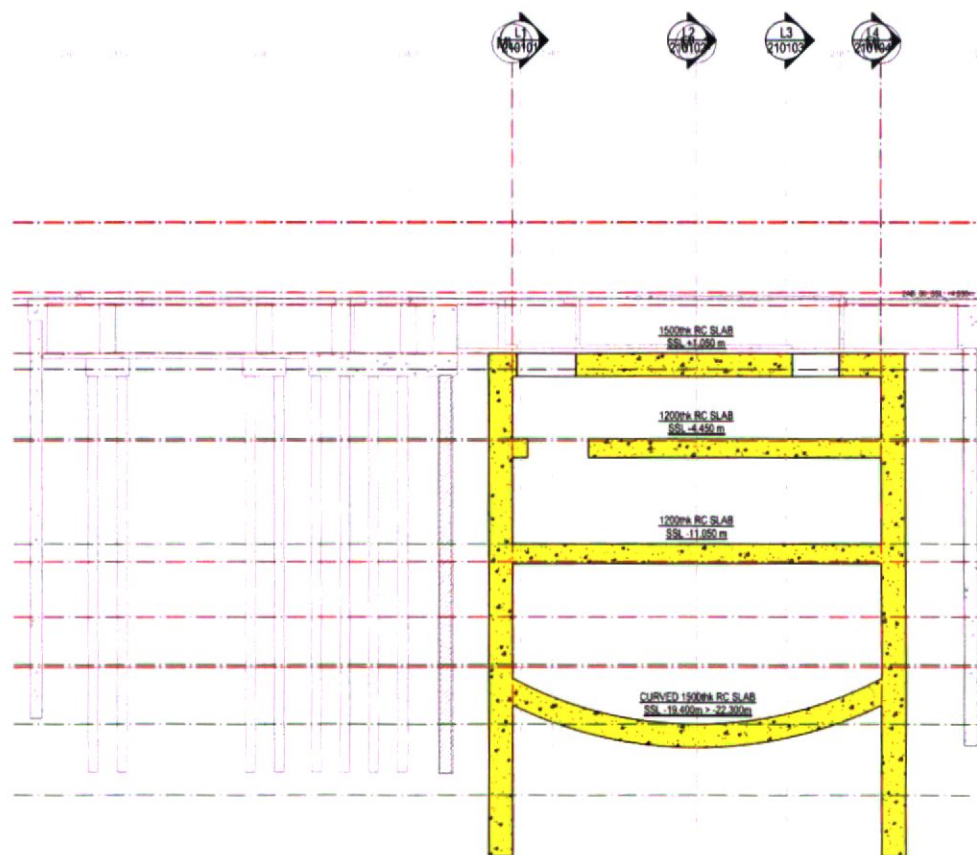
Section showing independent MEW works and oversite development basement and foundation
